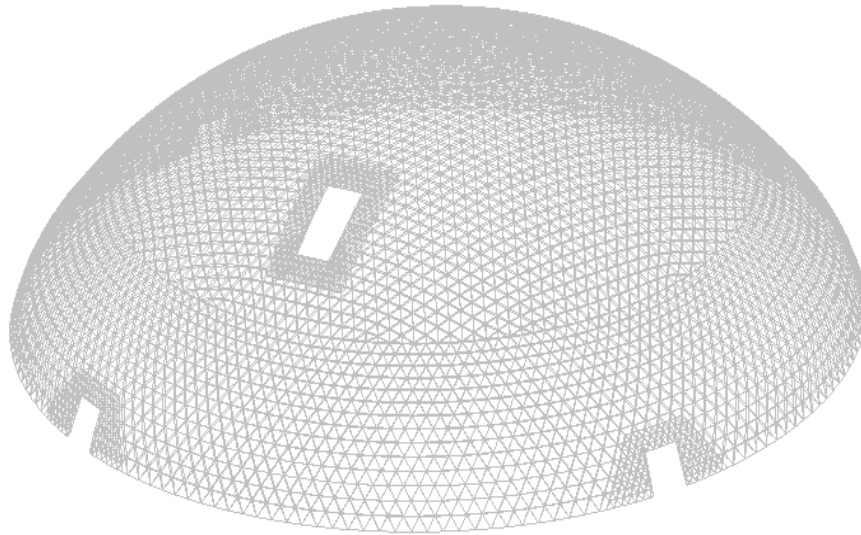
Dome with opening size 9.72 m x 4.74 m with reinforcement
